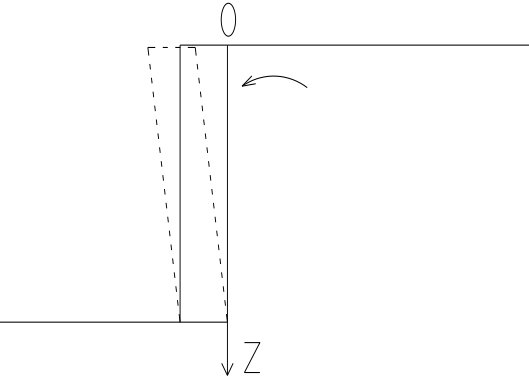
Turn of retaining wall around the foot out of the backfilling.
